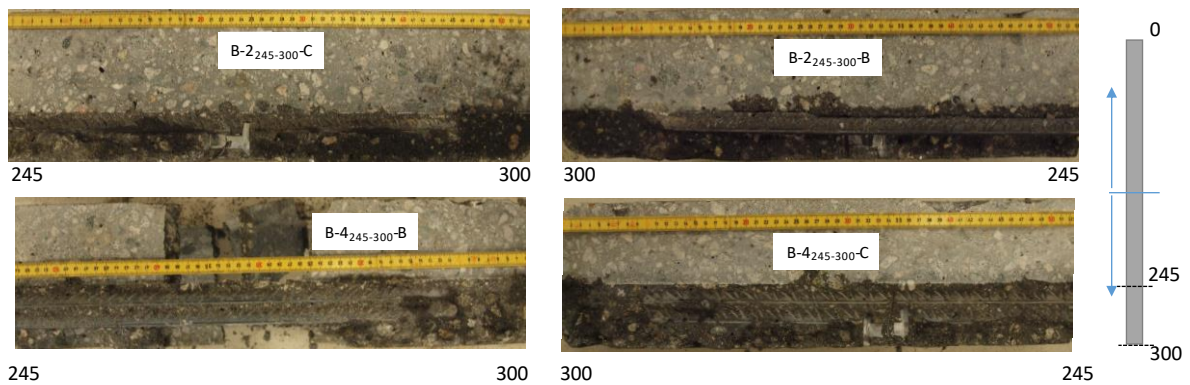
Steel-concrete interface of beam B section 245 to 300 cm. Localized corrosion at the spacer and distributed pitting 10 cm away from spacer
